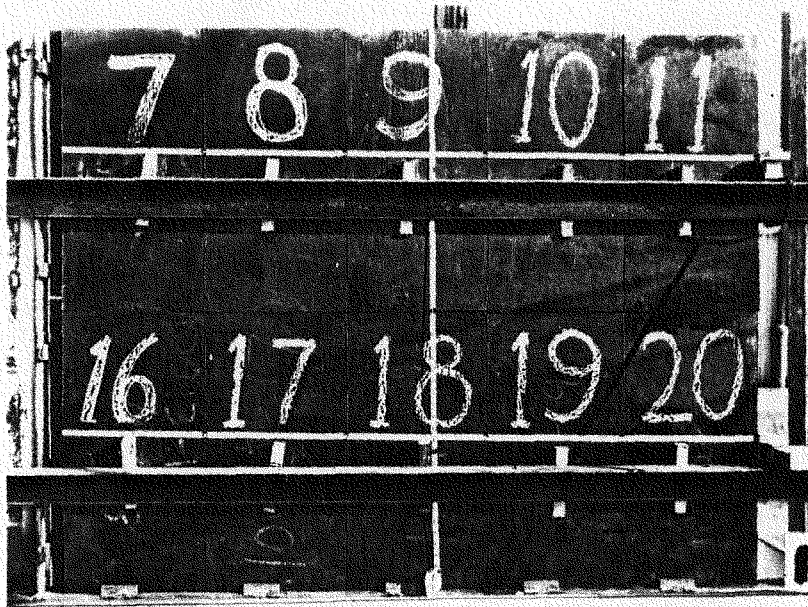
Cast tongue and groove slab wall used for shielding at Battelle Northwest Laboratories
